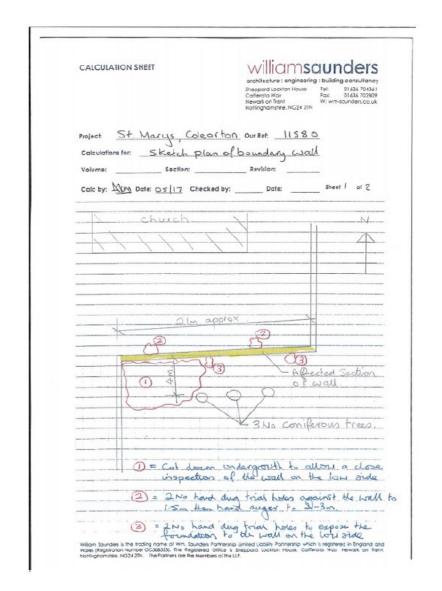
Sketch plan of St Marys Church showing location of trial holes (Provided by client)
